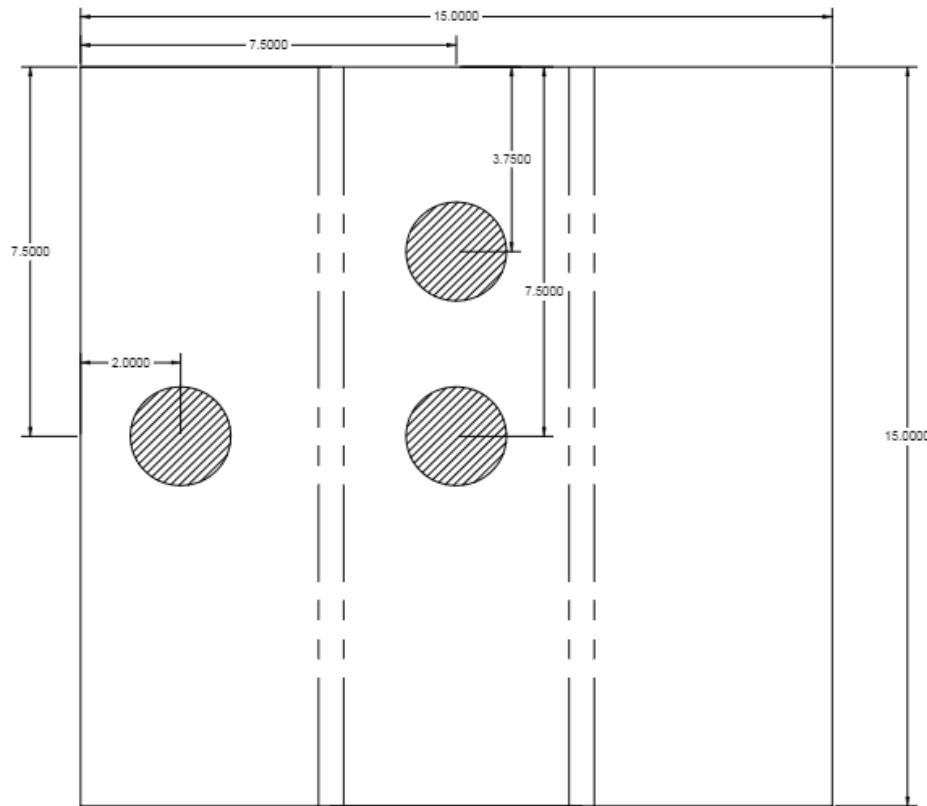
Schematic layout of sample coring locations after the end of exposure tests.
